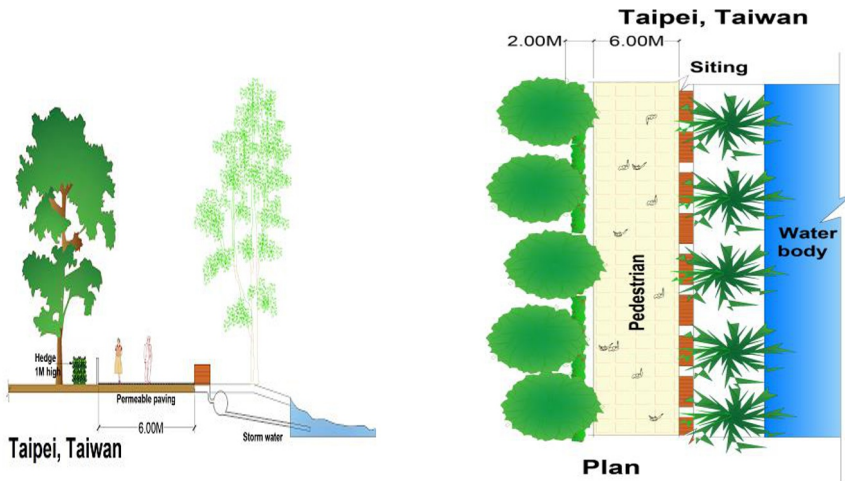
Taipei pedestrian walkways Typical plan & section. Source: - Author's
